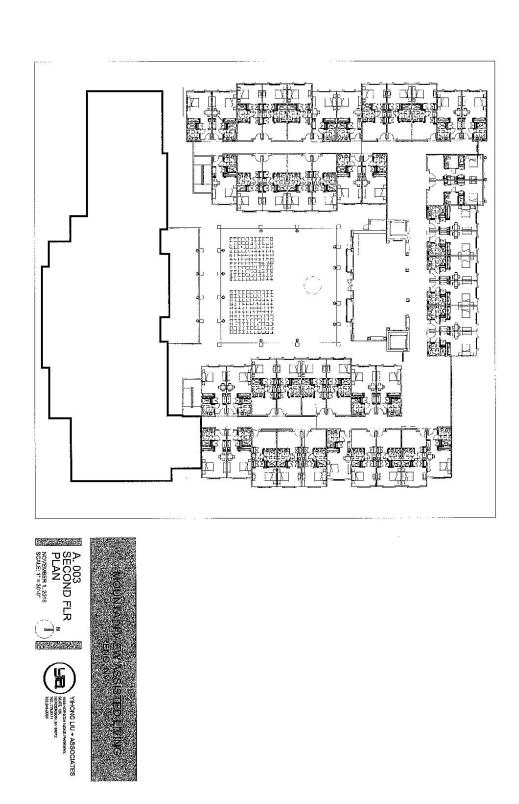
32 BED MEMORY CARE/82 BED ASSISTED LIVING GROUND 2ND FLOOR PLAN
